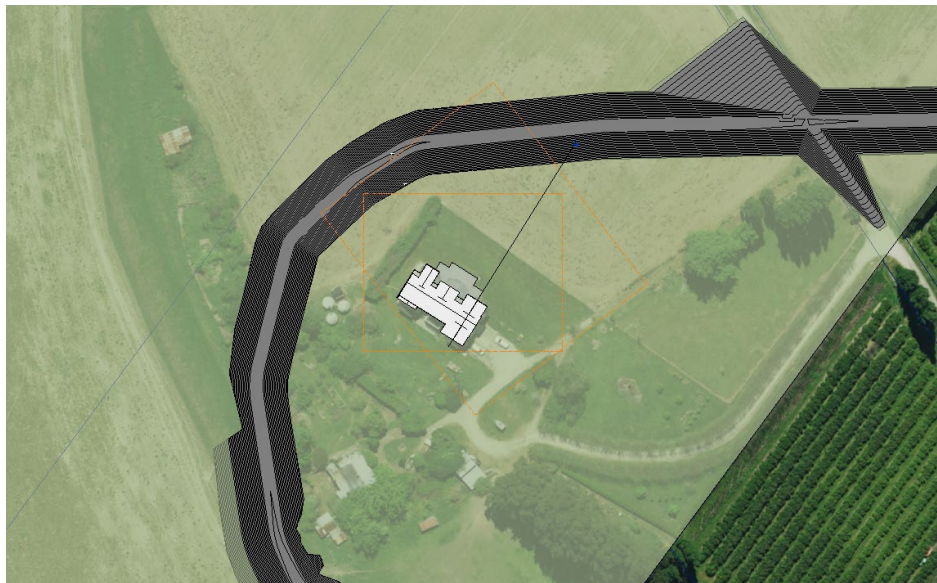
Plan View: Revit model elements including indicative house (LINZ building outlines data and indicative 8m height). Shelter belt planting from aerial imagery. Stopbank topography from design team.
